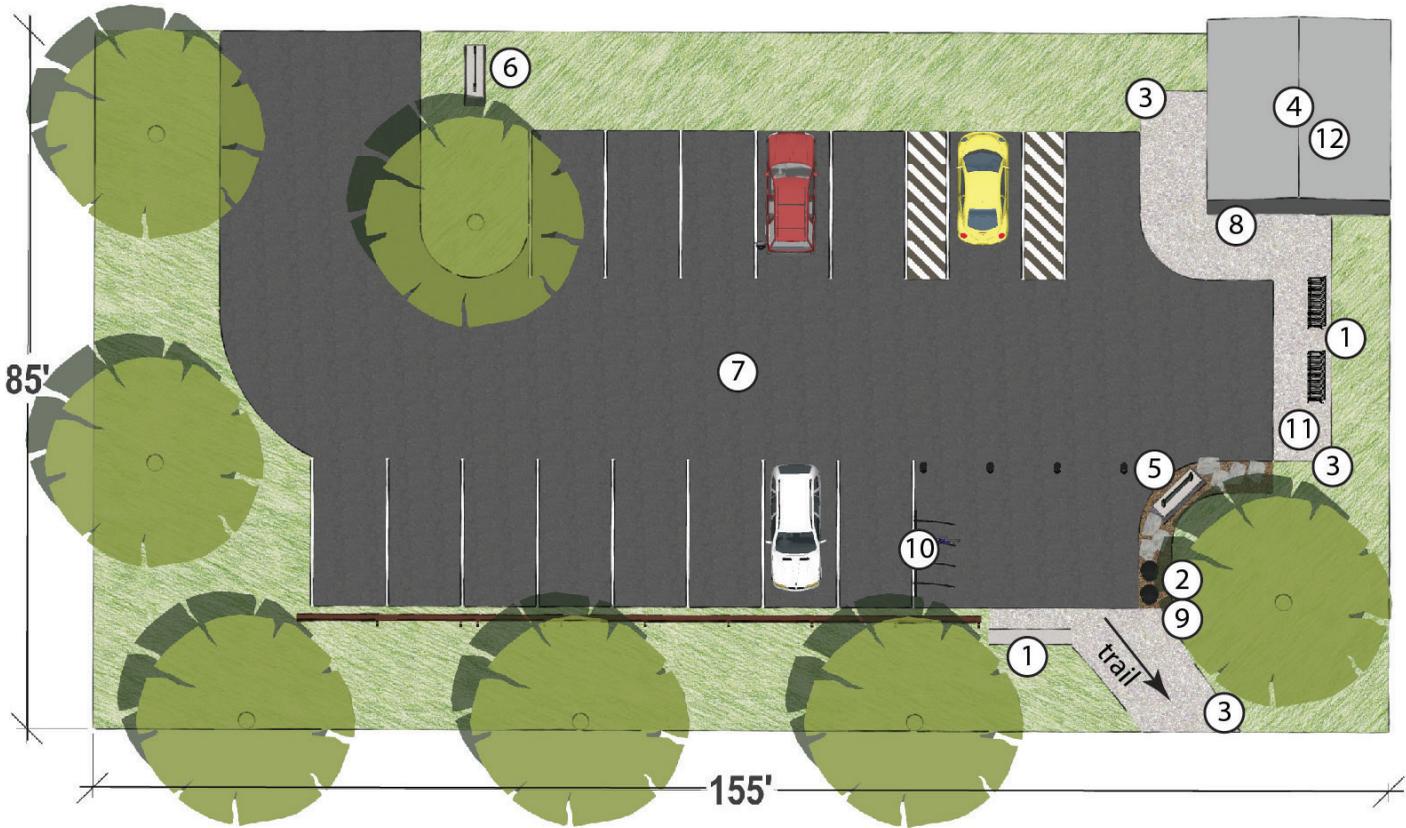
Illustration of a Typical Trailhead Layout (1/3 acre)
